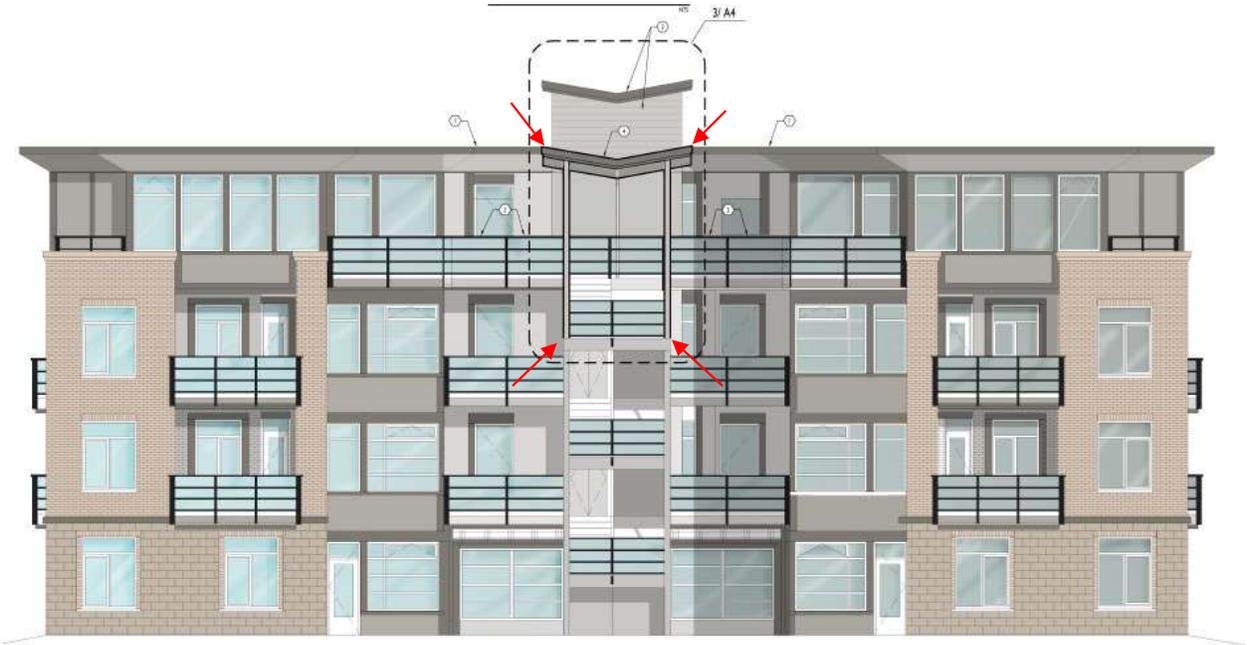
Proposed roof over stairway for 5692 Kings Road, Area D (red arrows not on plans).
